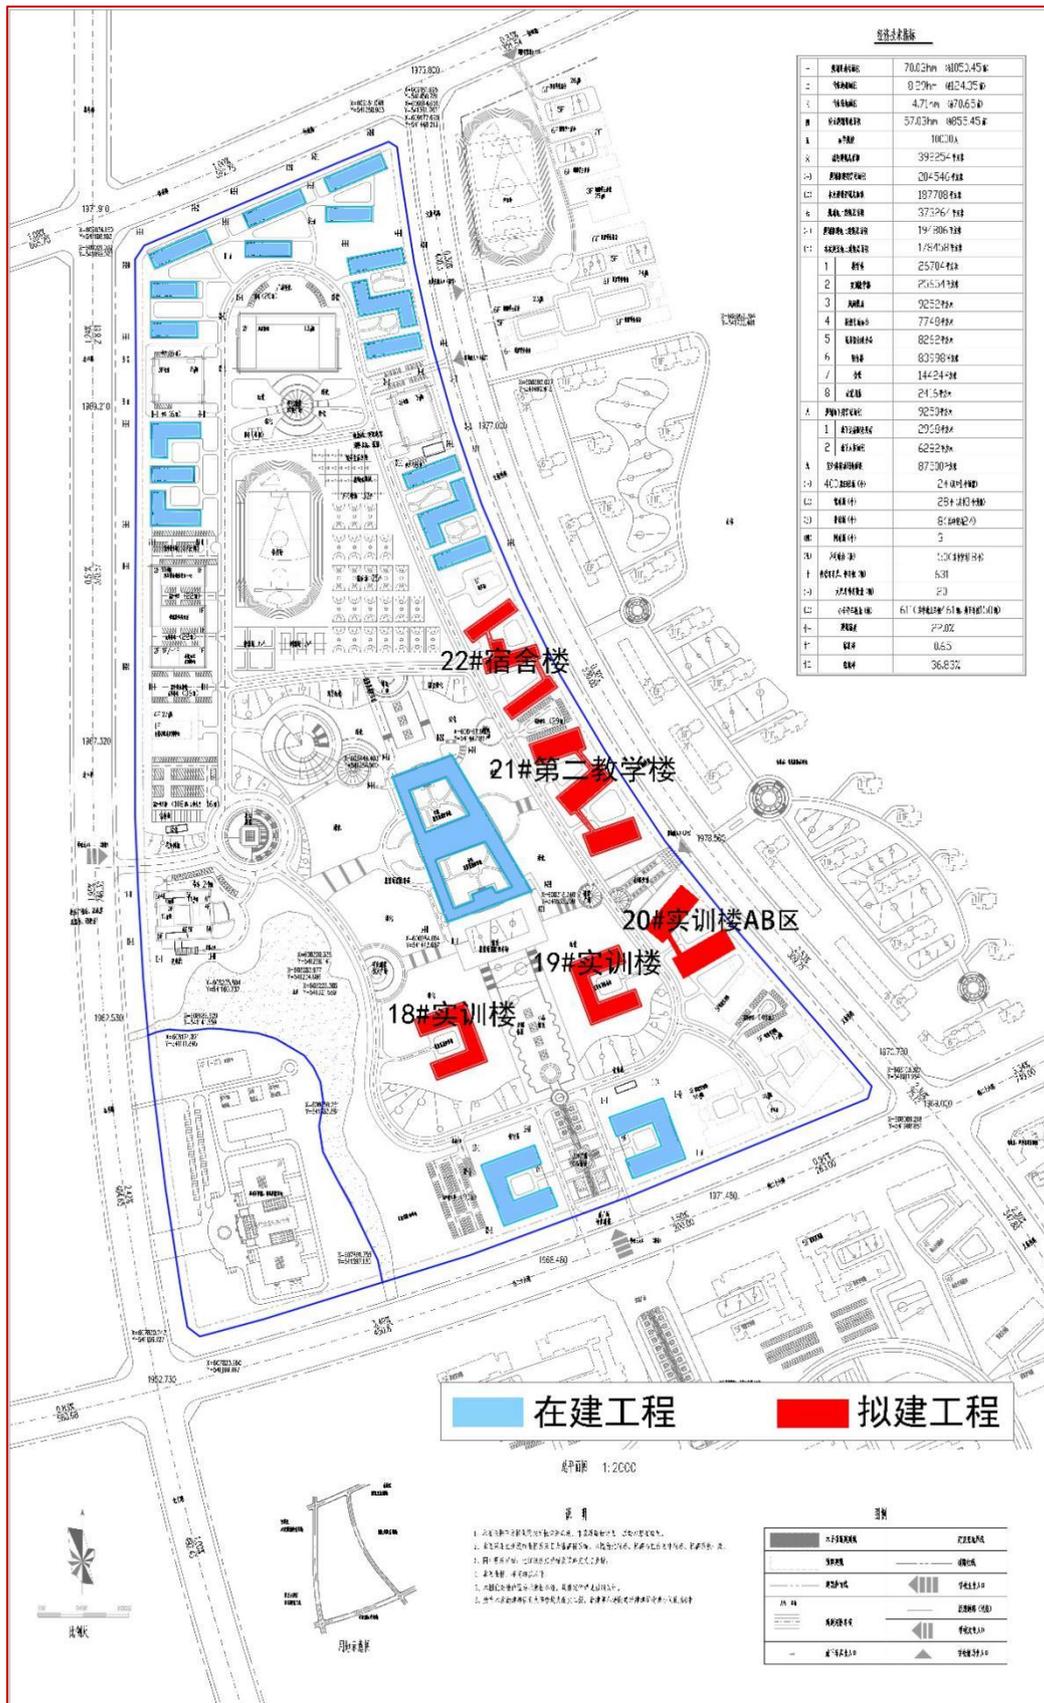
Layout Plan of Gansu Finance and Trade Vocational College
